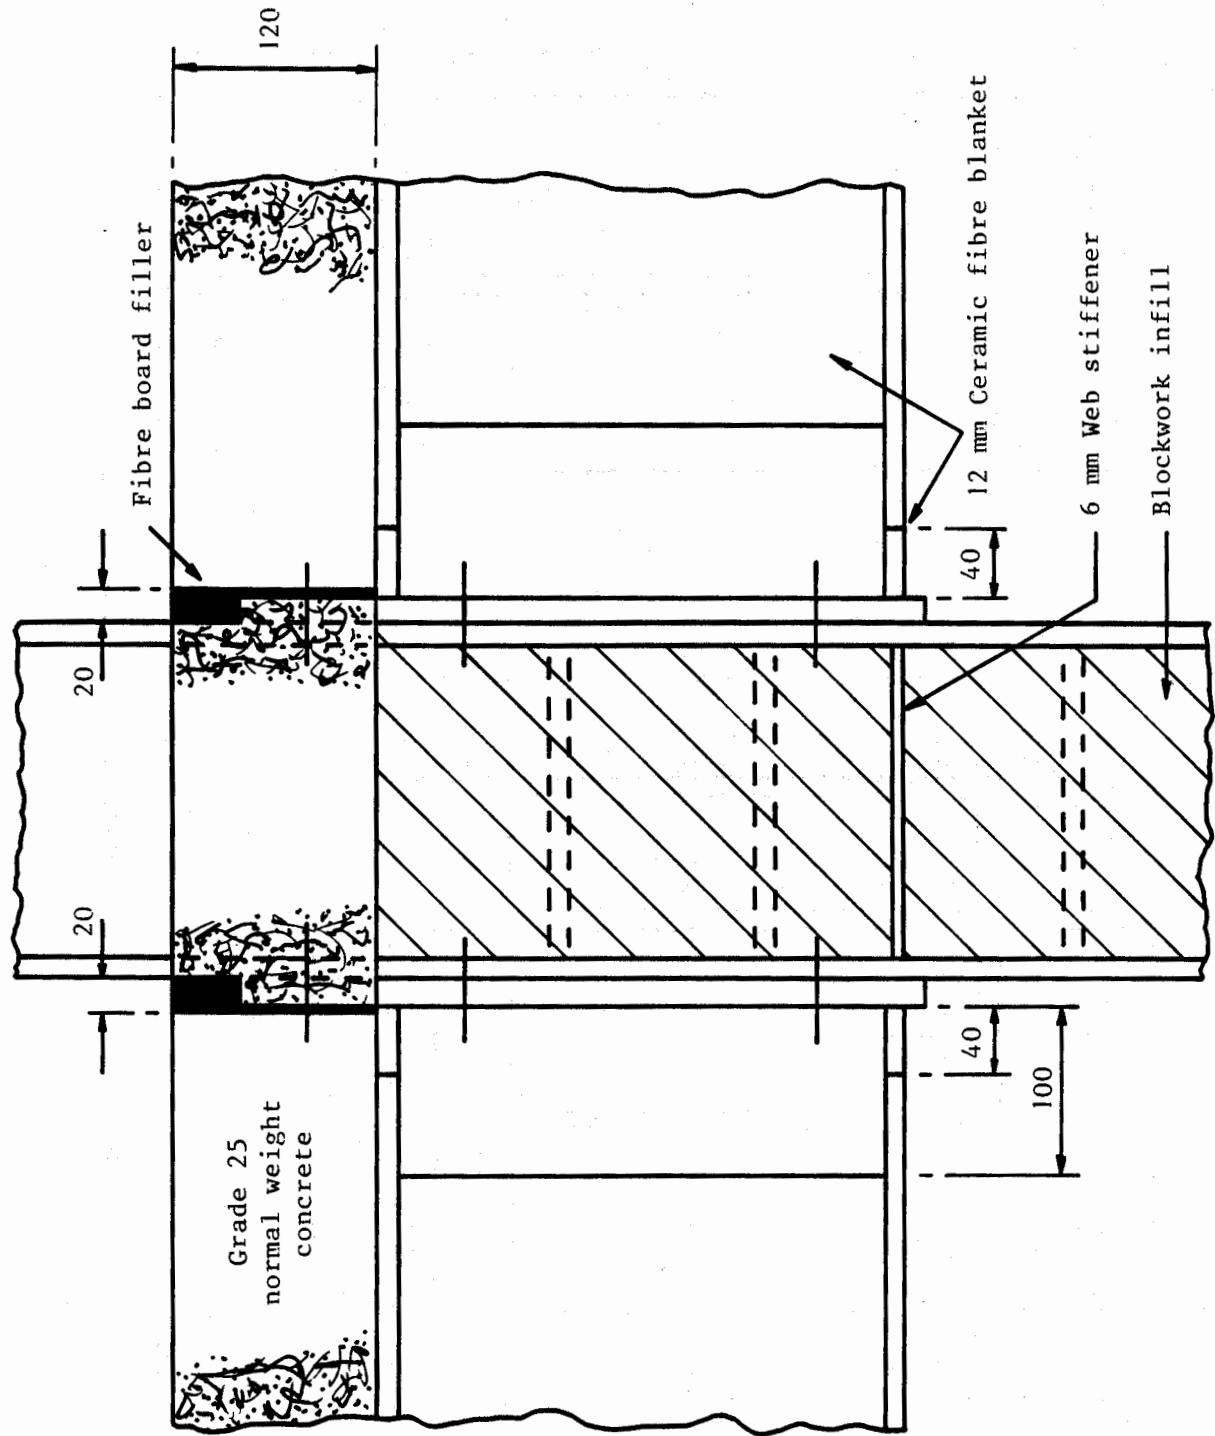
CONSTRUCTION DETAILS FOR ASSEMBLY NO. 1 (R4/3645)
